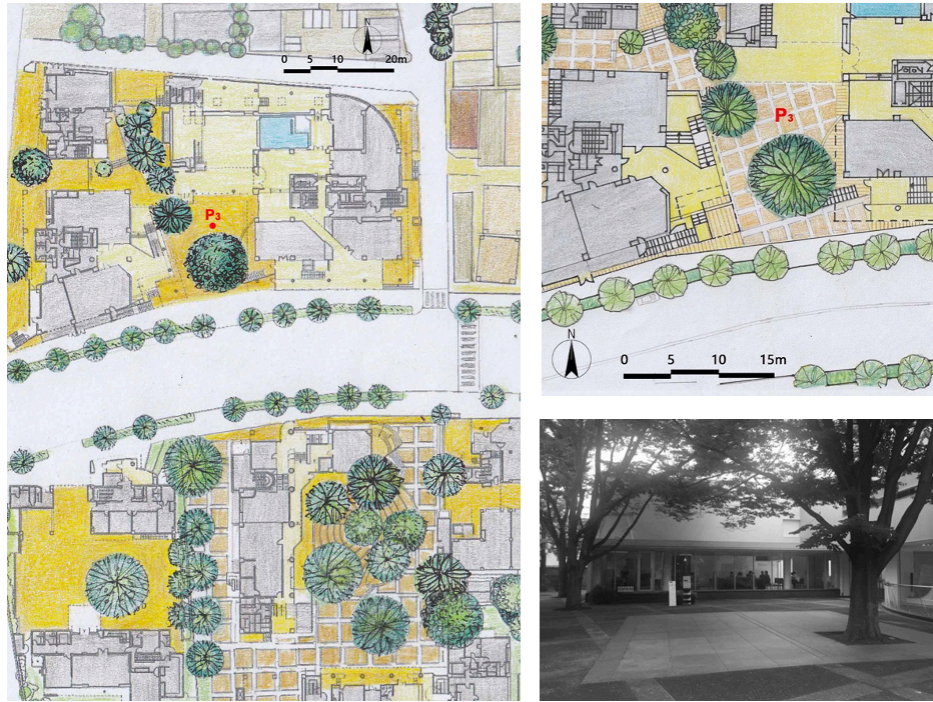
The big plaza (P) in front of Building F. (Source from: drawing and photo from the author)
